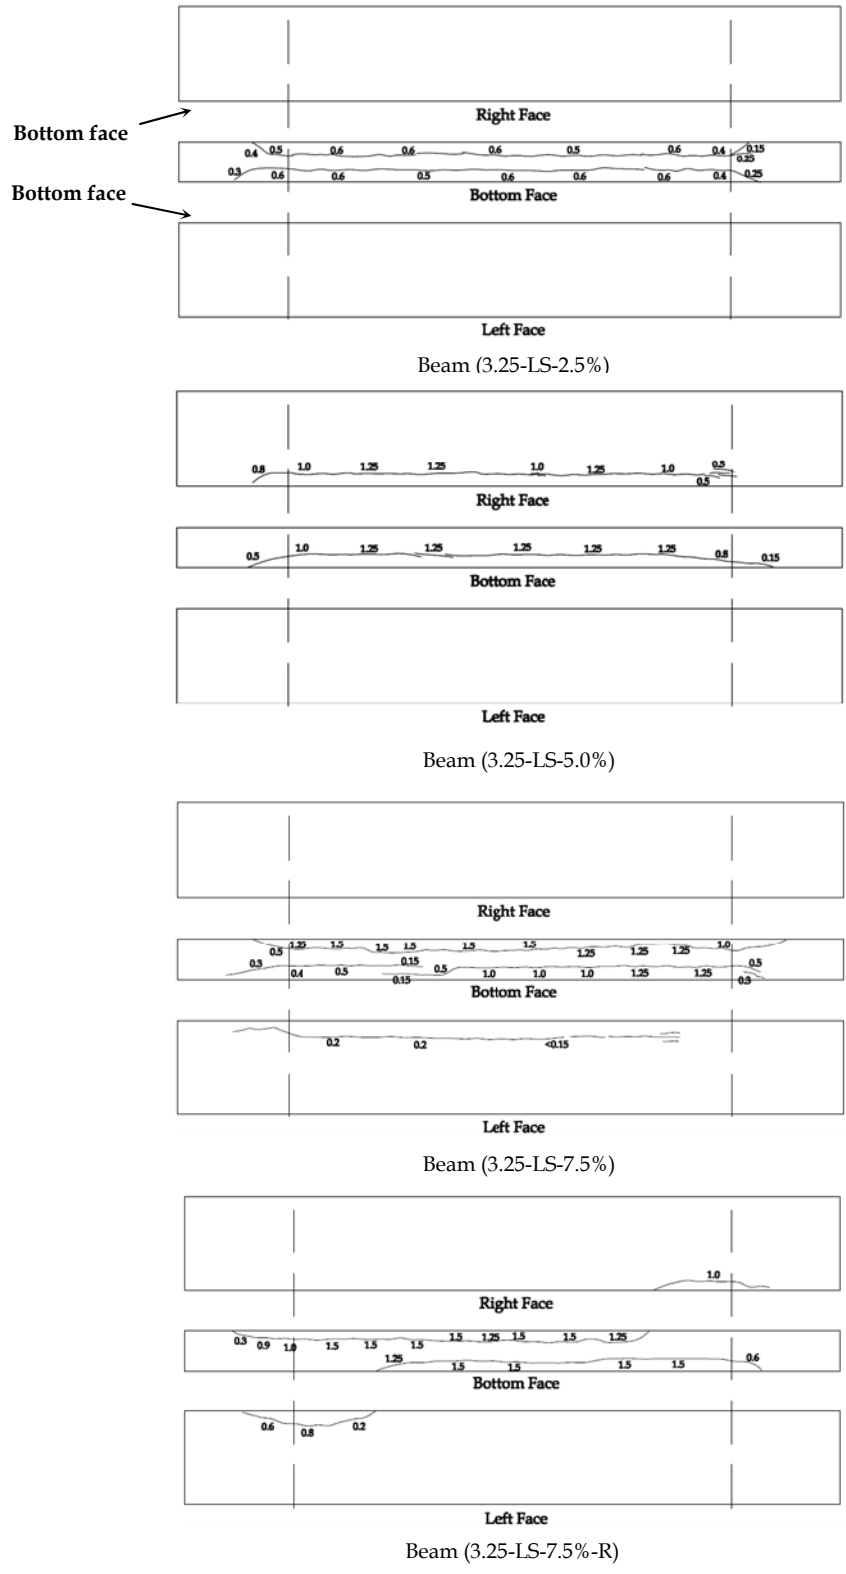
Corrosion crack patterns and crack widths of slender beams with stirrups
